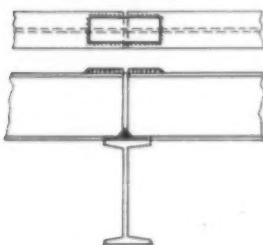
Stringers Welded to Floorbeam; Continuity of Stringers Effected by Welding
